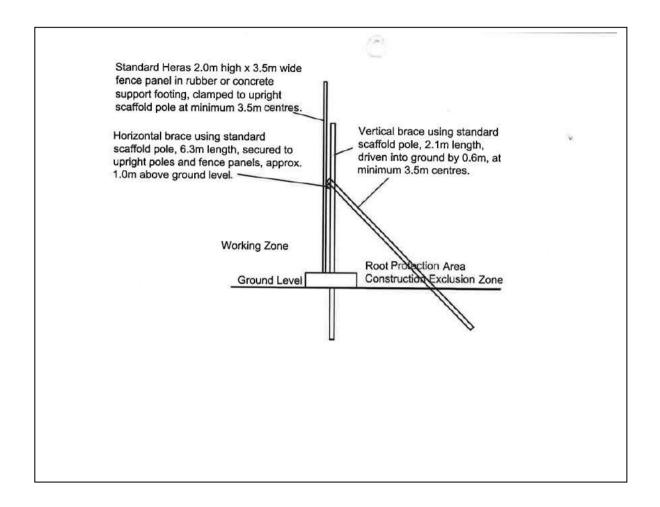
Temporary Protective fencing, detail approved by ELC. We require that this detail and specification is clearly shown on the site layout and landscape proposal plan.
